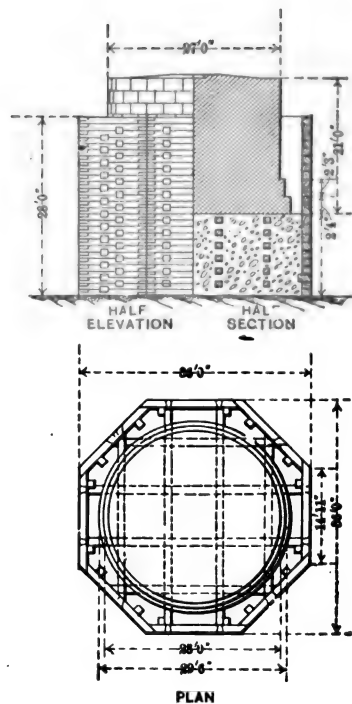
COFFER-DAM FOR PIVOT PIER OF THE COTEAU BRIDGE.
